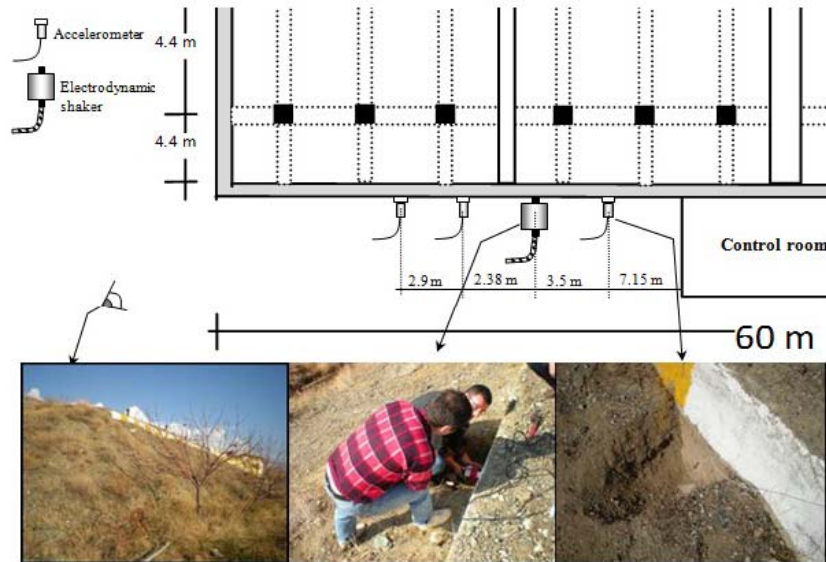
The general test setup and instrumentation on front exterior wall of TANK_B (TEST_1)
